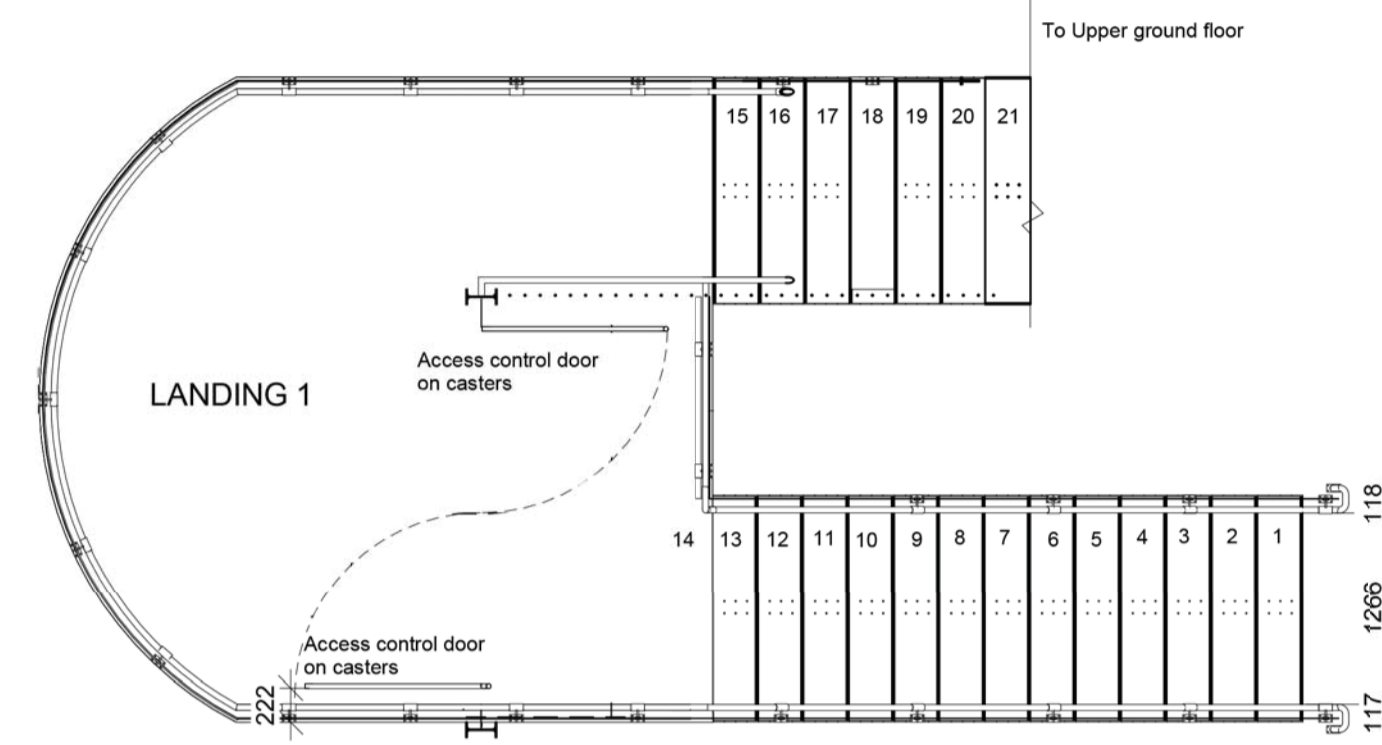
LANDING 1 PLAN SCALE 1:50
